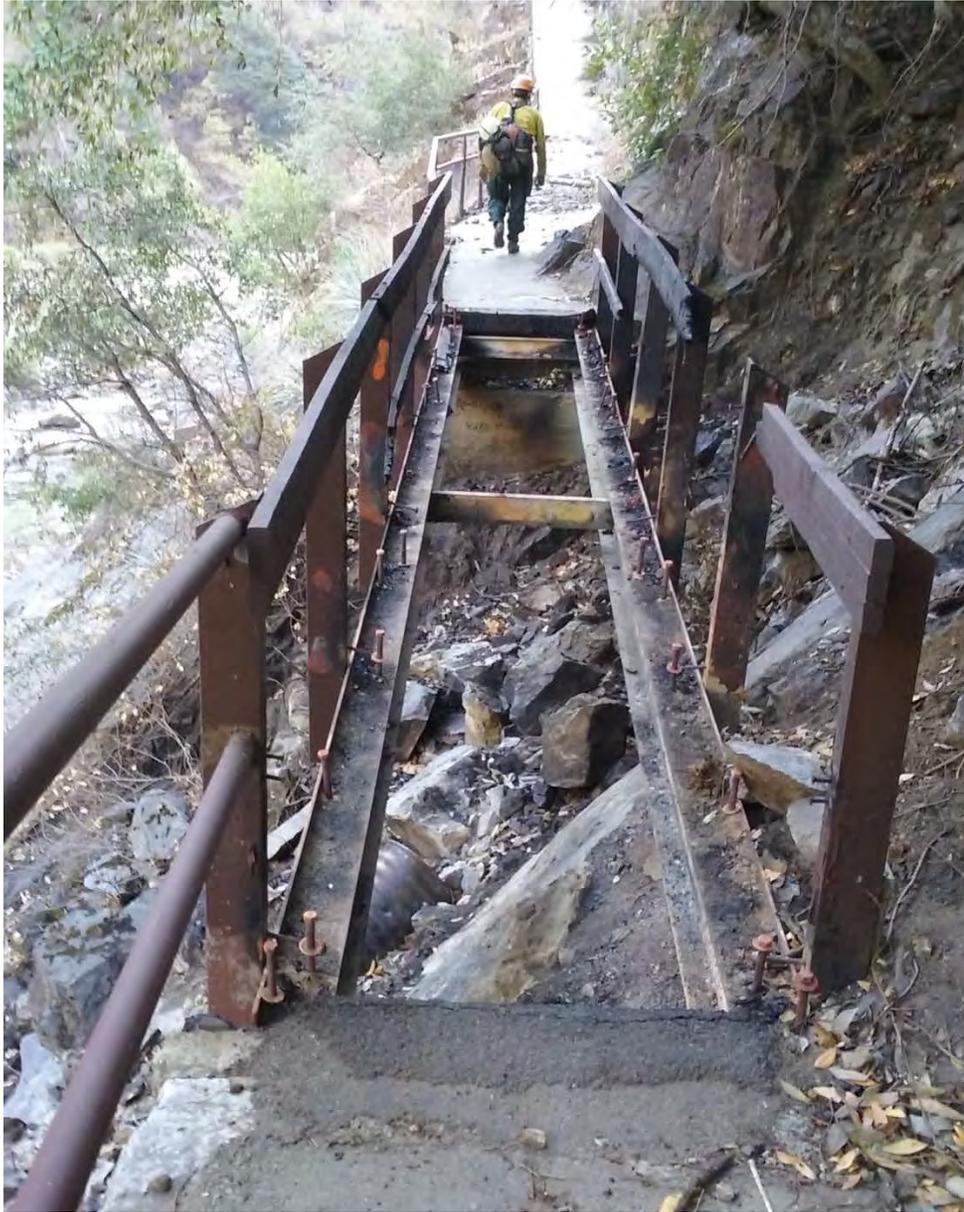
Burned Bridge Decking and Railings on Boyden Cave Pathway
